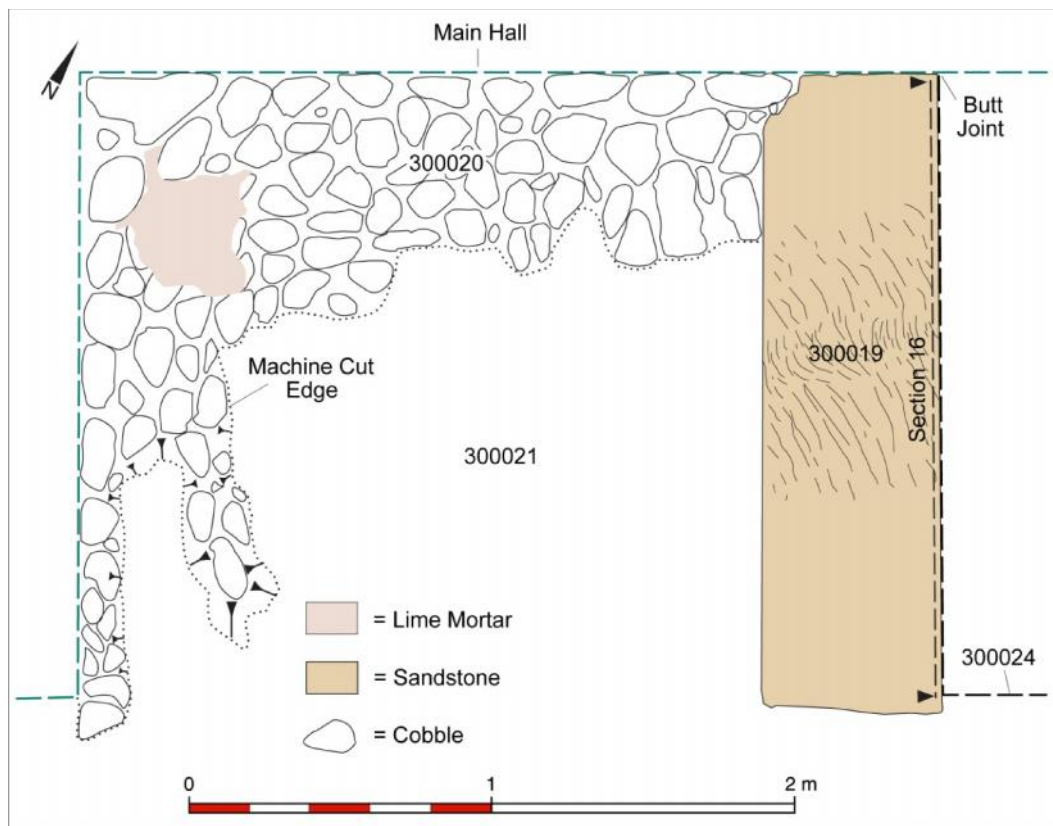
Plan showing Trench 30 before 2012 ground reduction.
